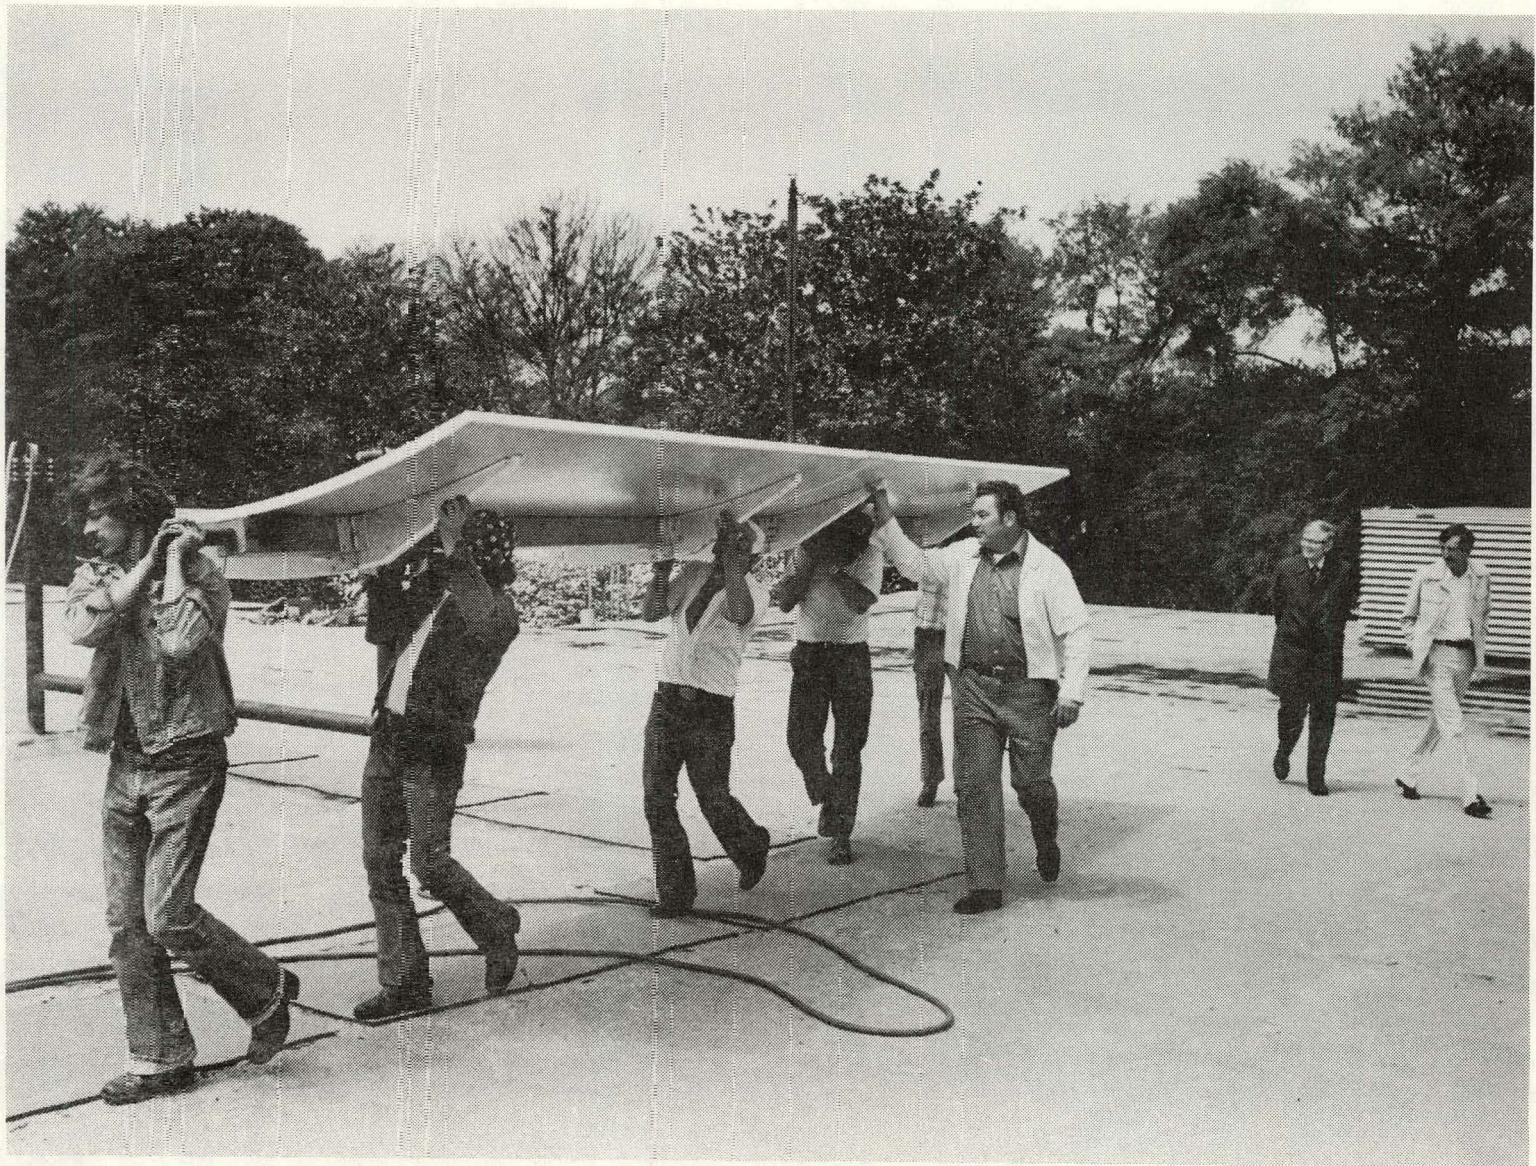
Collector Mirror Assembly Being Hand-Carried to Supports,
